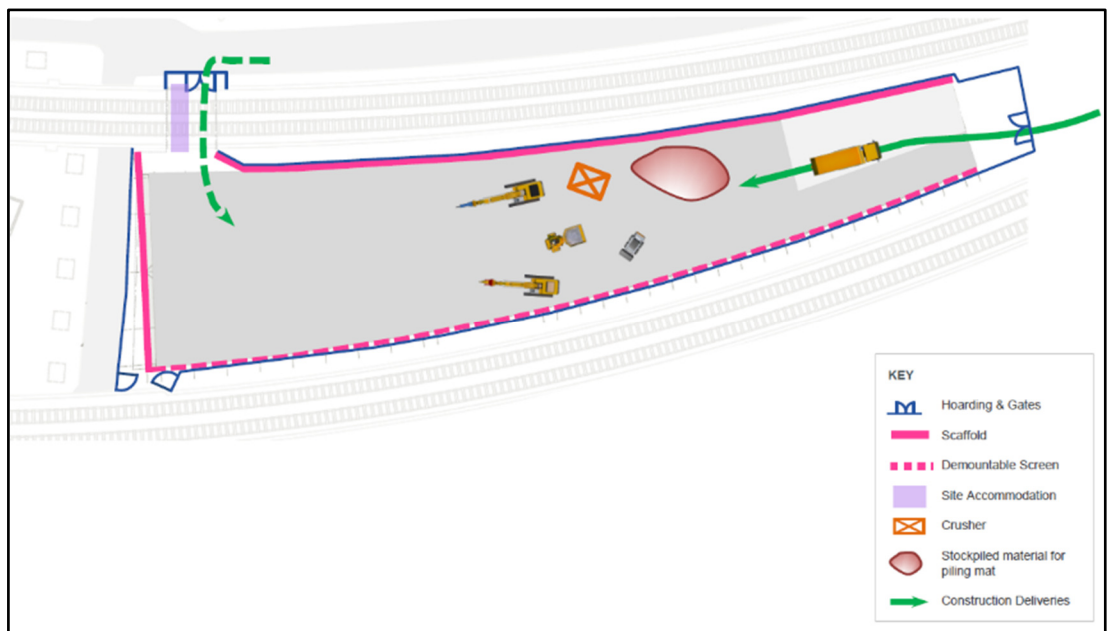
Demolition Phase Construction Arrangement (Blue Sky Building Plan)
